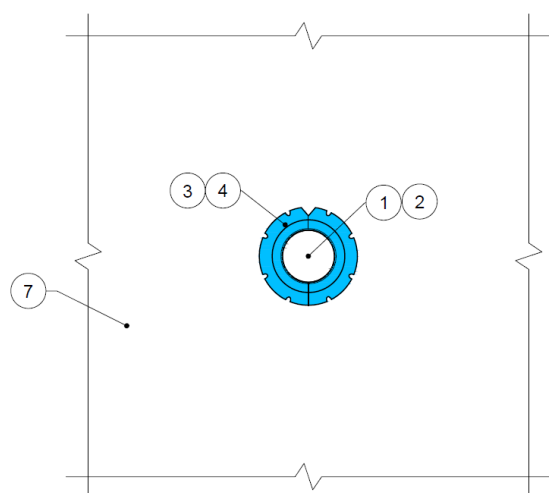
Plastic pipe with PROMASEAL® FCS 250-300 collars (floor underside plan view)
